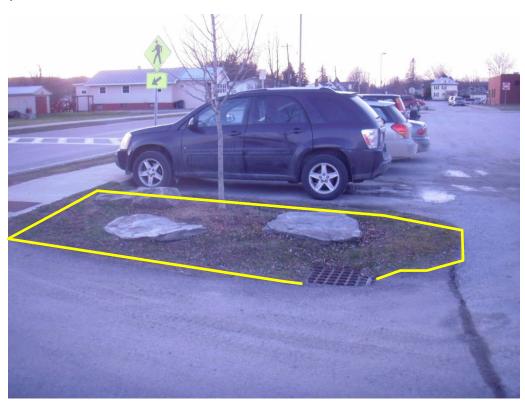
This parking island could be utilized to treat stormwater with a simple retrofit design creating a small bioretention basin.
